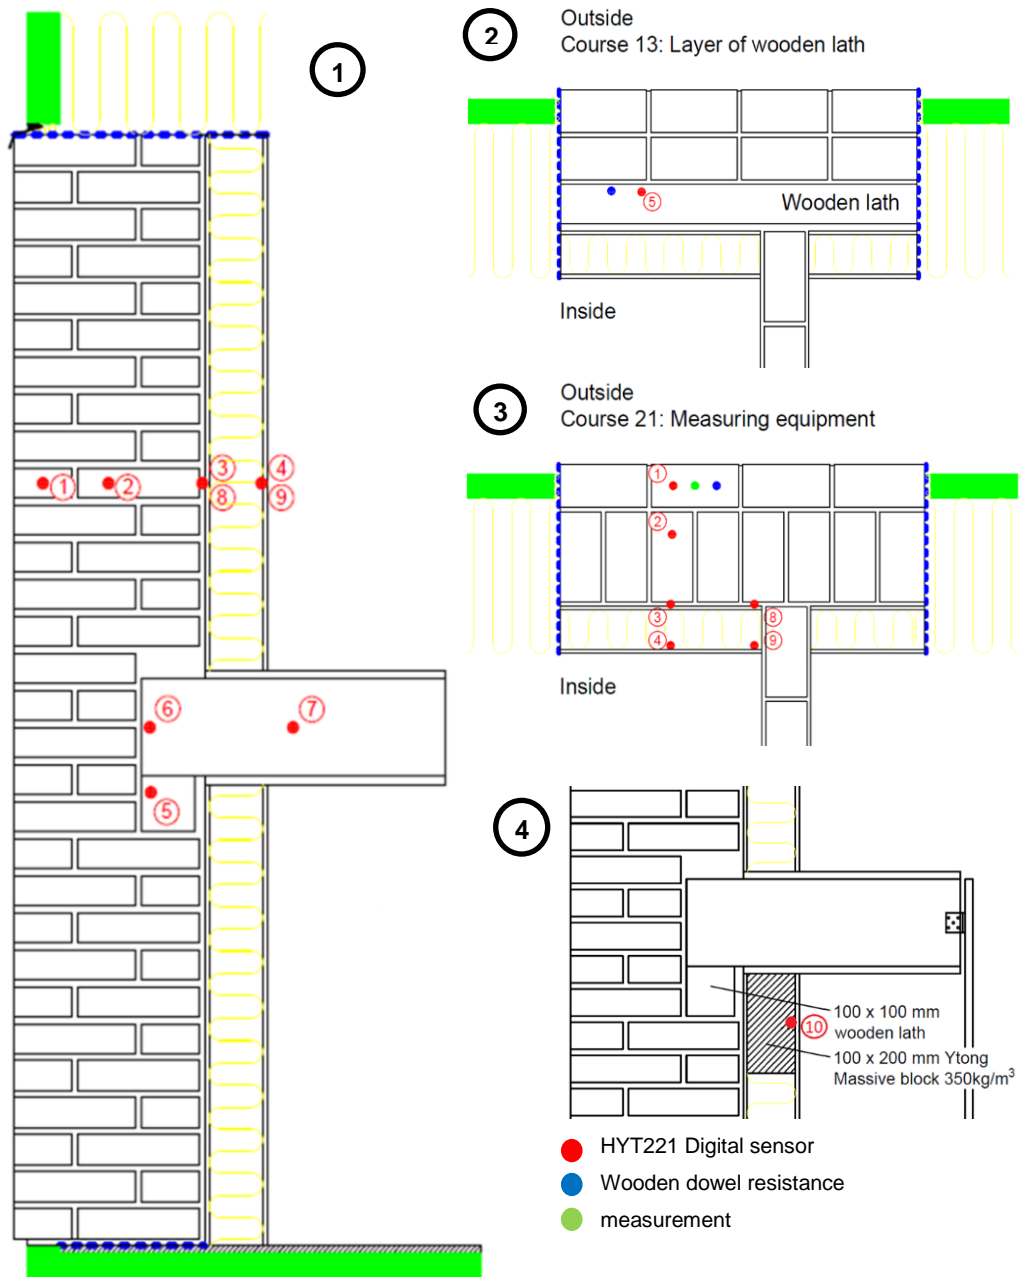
Sensor placement. 1) Vertical section showing sensor placement. 2) Horizontal section at masonry course 13 showing sensor placement. 3) Horizontal section at masonry course 21 showing sensor placement. 4) Vertical section showing sensor placement in AAC block below the floor structure
